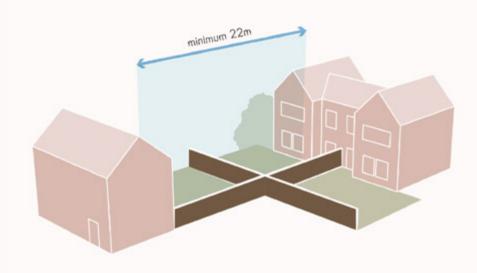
Standard back-to-back distances between habitable room windows above the ground floor.
